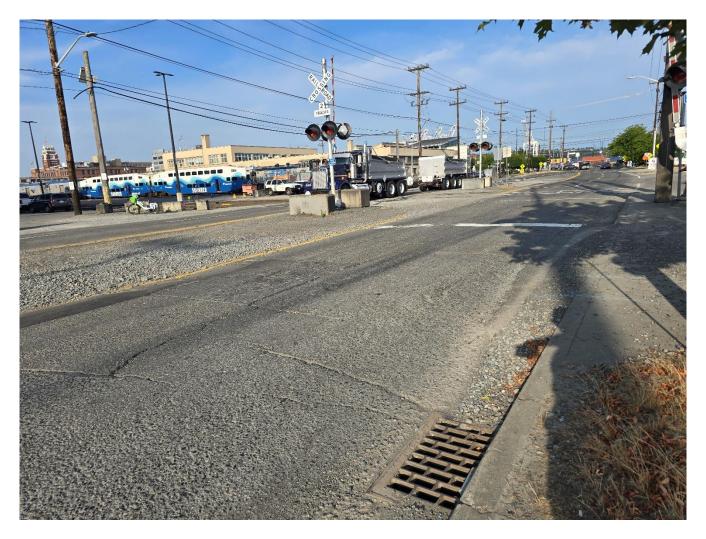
S HOLGATE ST AND DOT# 085583Y, ALLIGATORING, LONGITUDINAL AND LATERAL CRACKING, NE CORNER LOOKING SW
